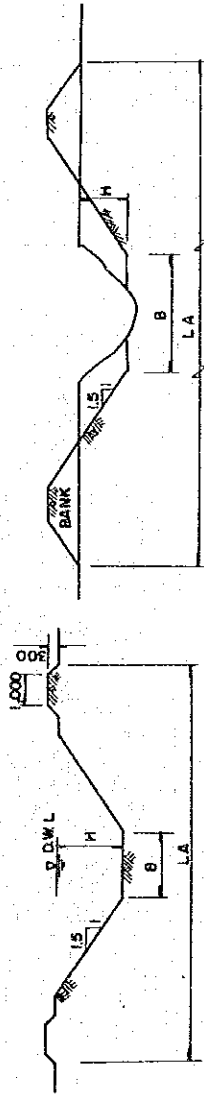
LAYOUT OF DRAINAGE FACILITIES AND FARM ROAD
